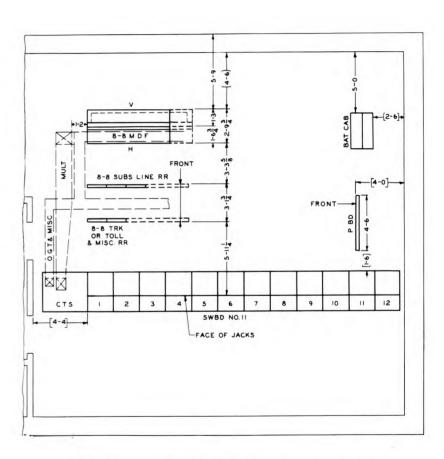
Switchboard - Floor Plan (Western Electric Co.)
